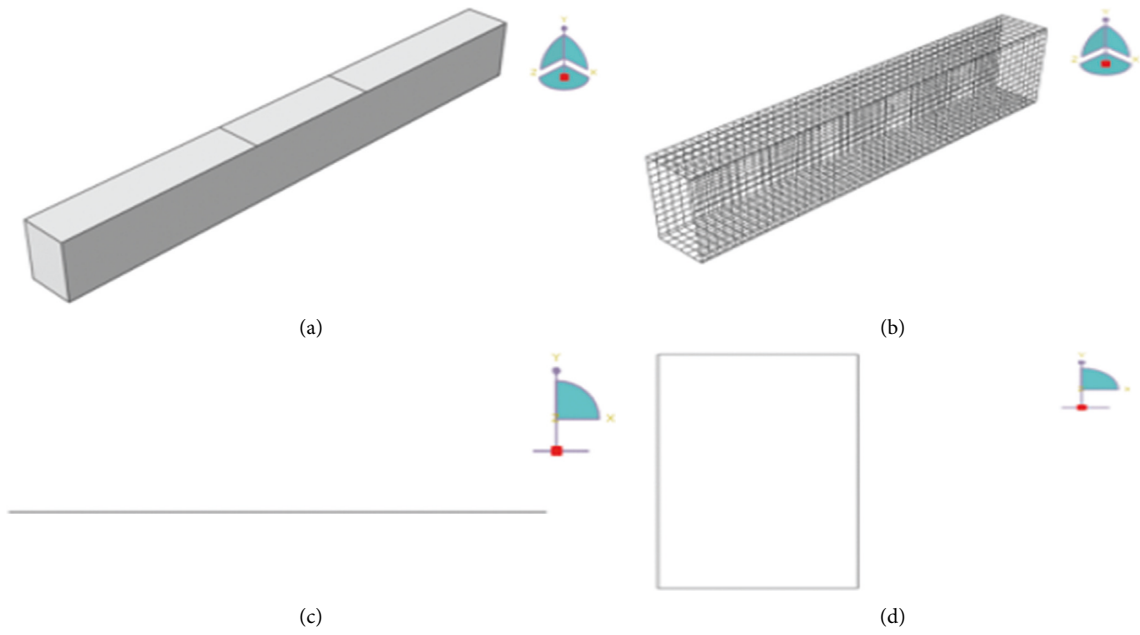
Geometric model for each parts (a) plain concrete beam; (b) wire mesh; (c) longitudinal bar; & (d) stirrup reinforcement).
